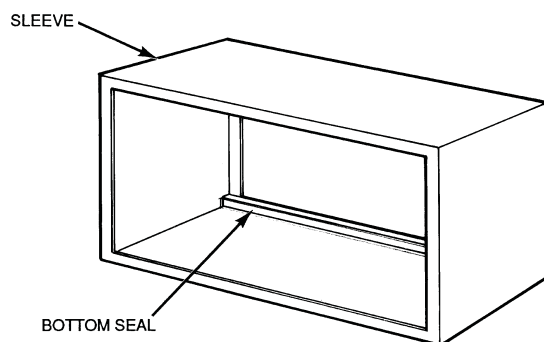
Remove Bottom Seal From GE Plastic Sleeve
